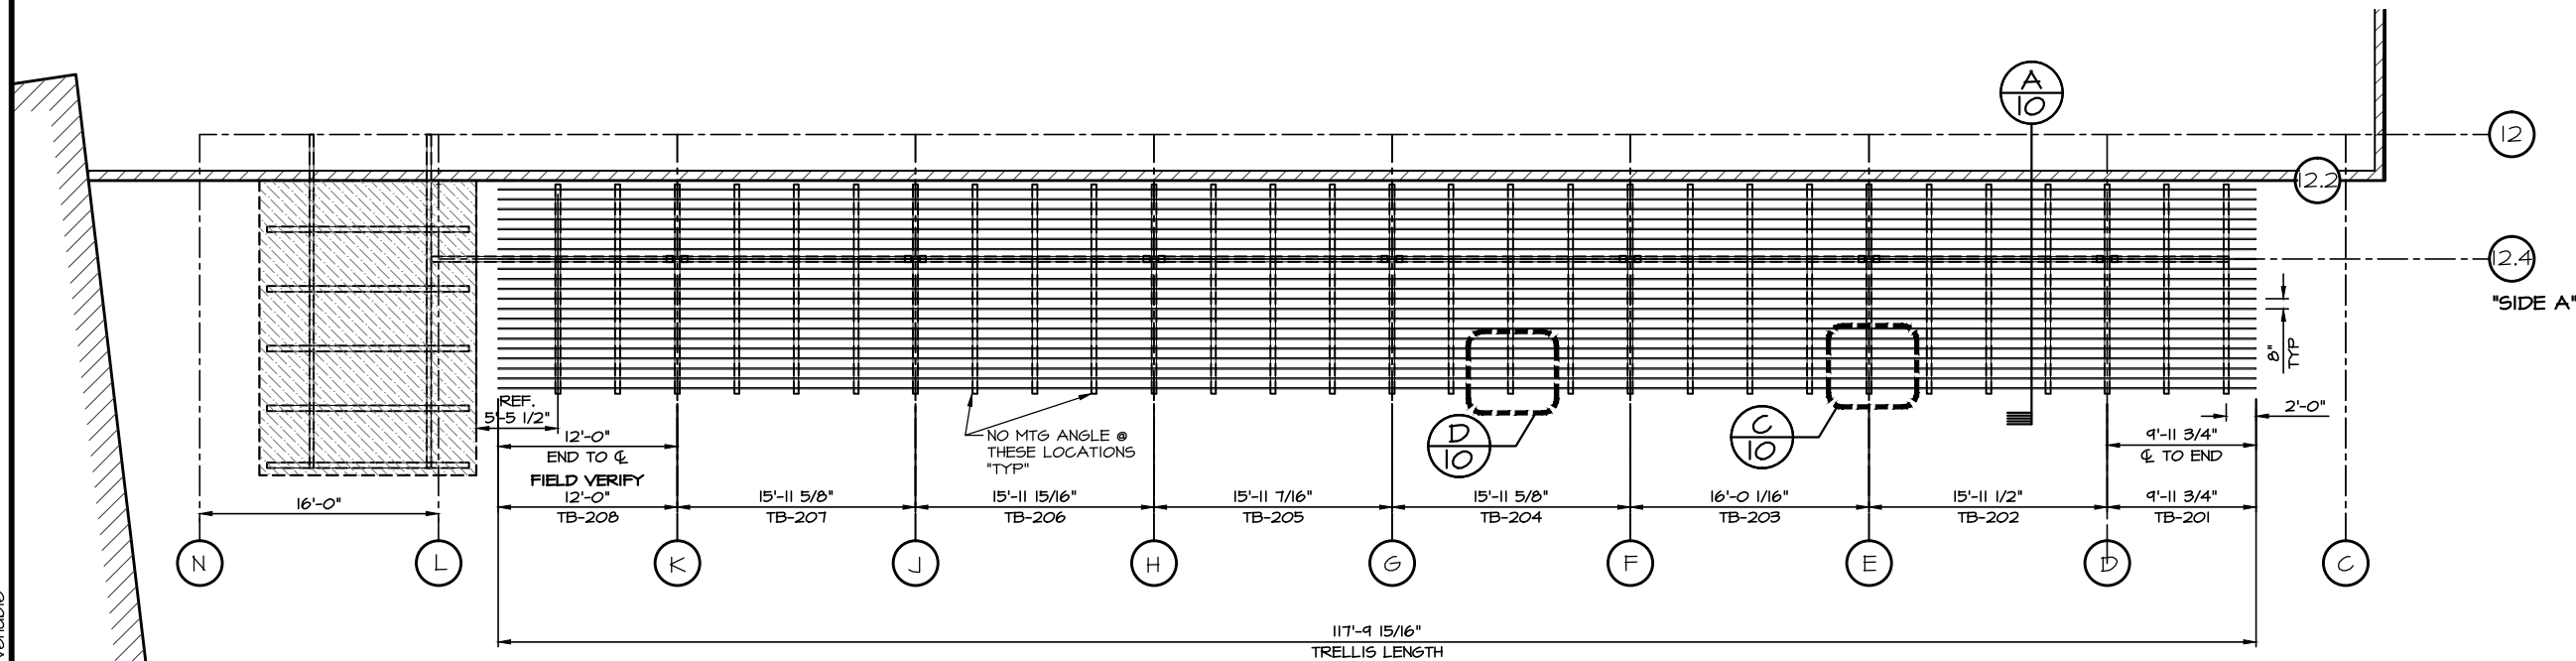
FF.dwg Layout: 4022-5R2
